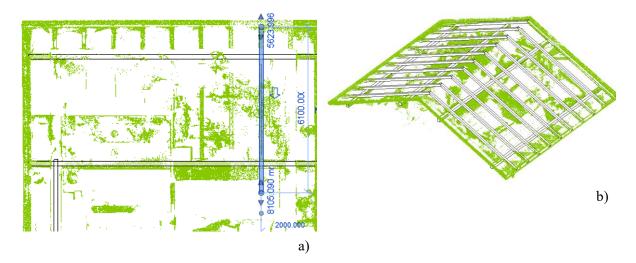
a) A timber finished drawing in the floor plan. b)The roof timber was drawn complete.
